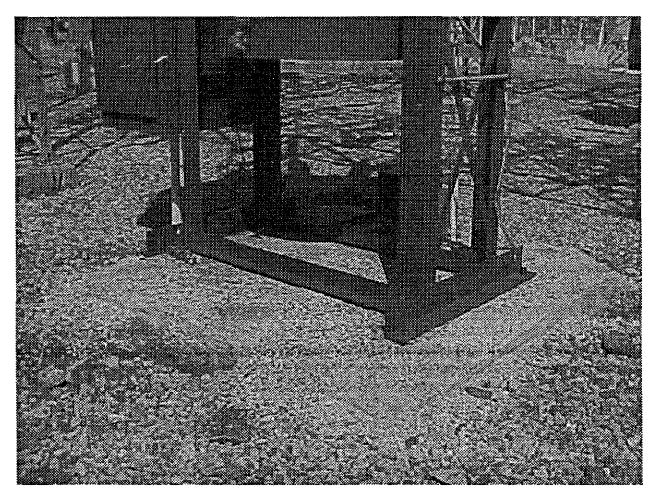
A typical concrete pad that would be a Condition 'E'.
